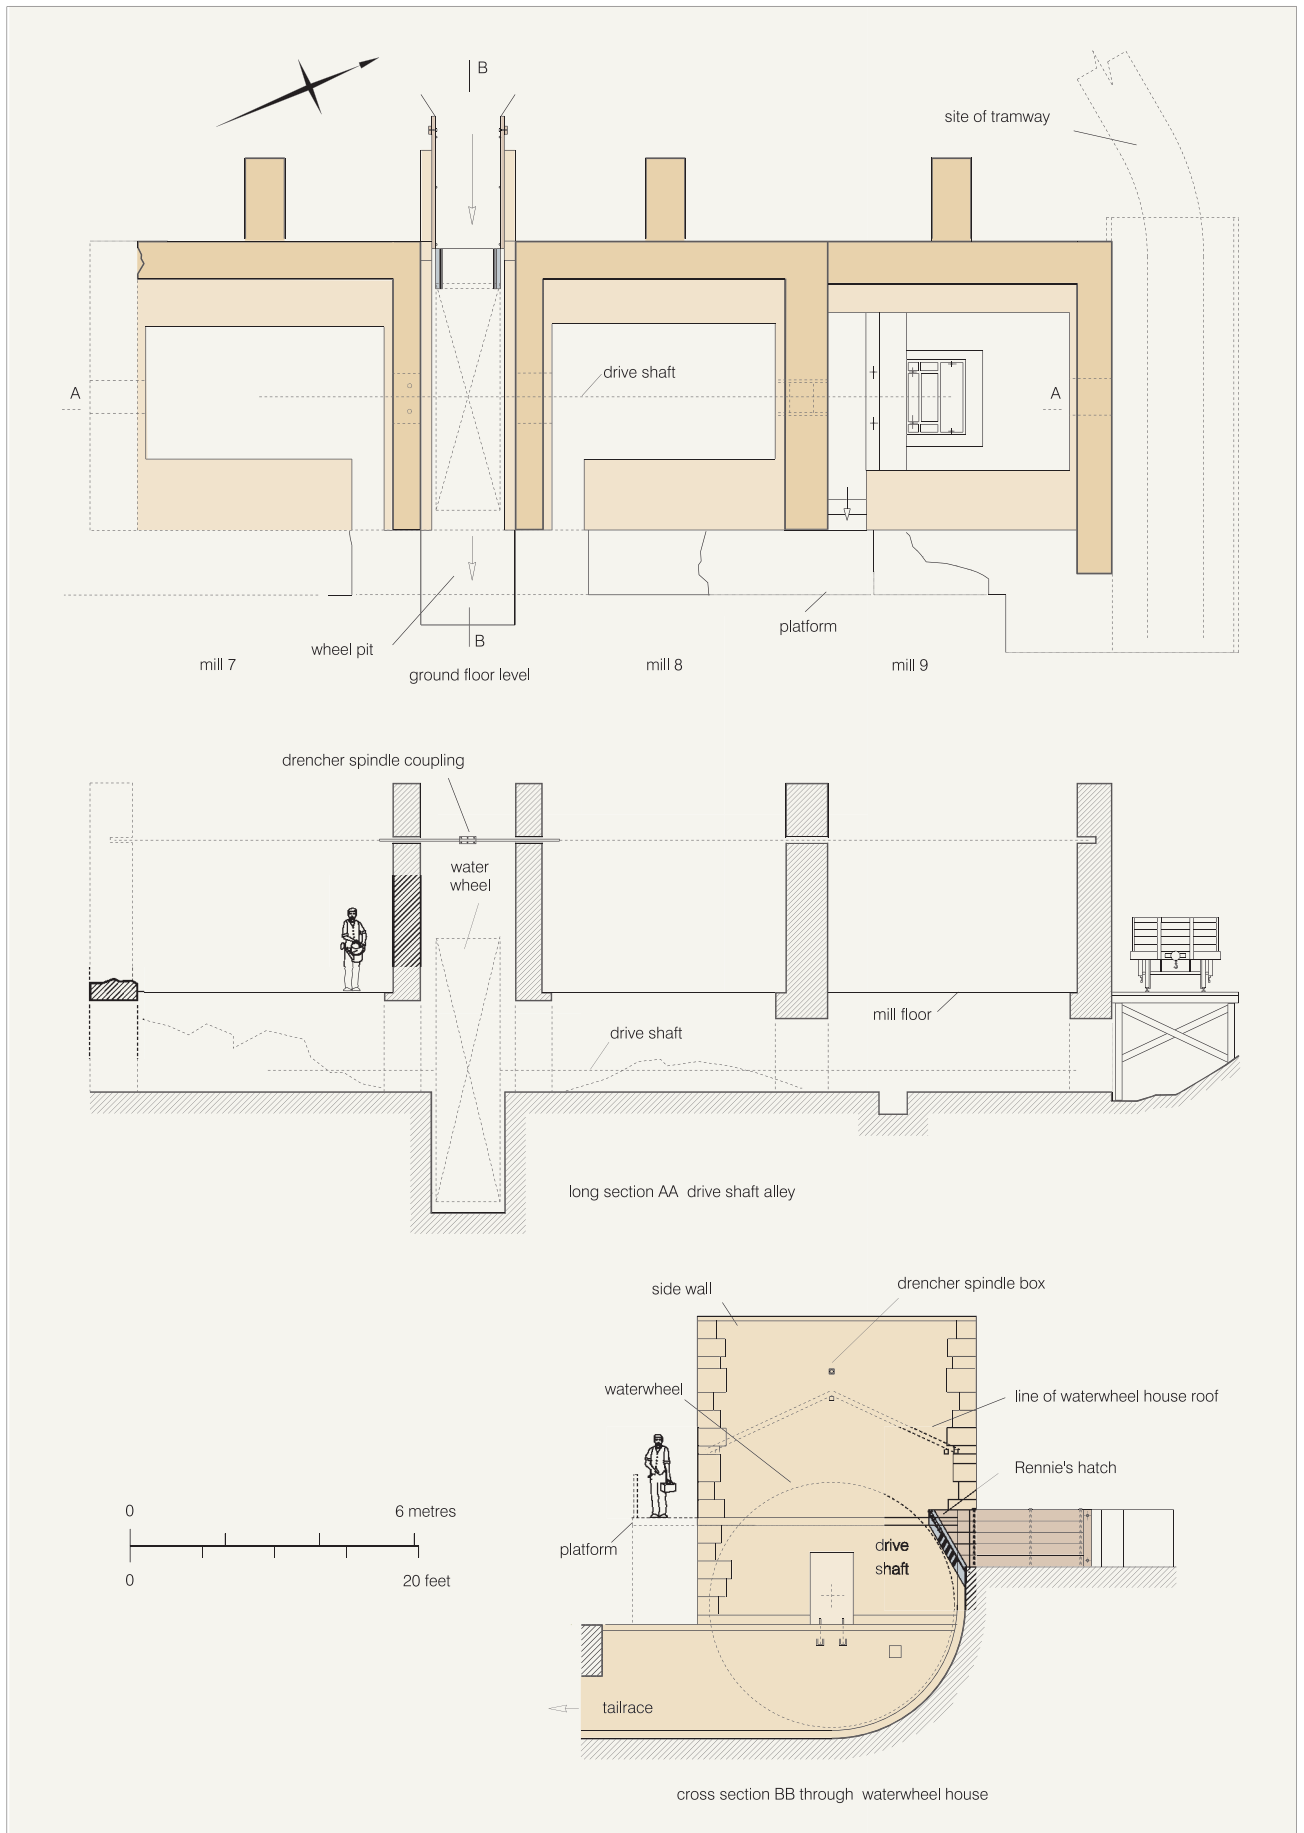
English Heritage plan and sections of incorporating mills 7-9 and waterwheel house (partial reconstruction to show tramway and platform)
